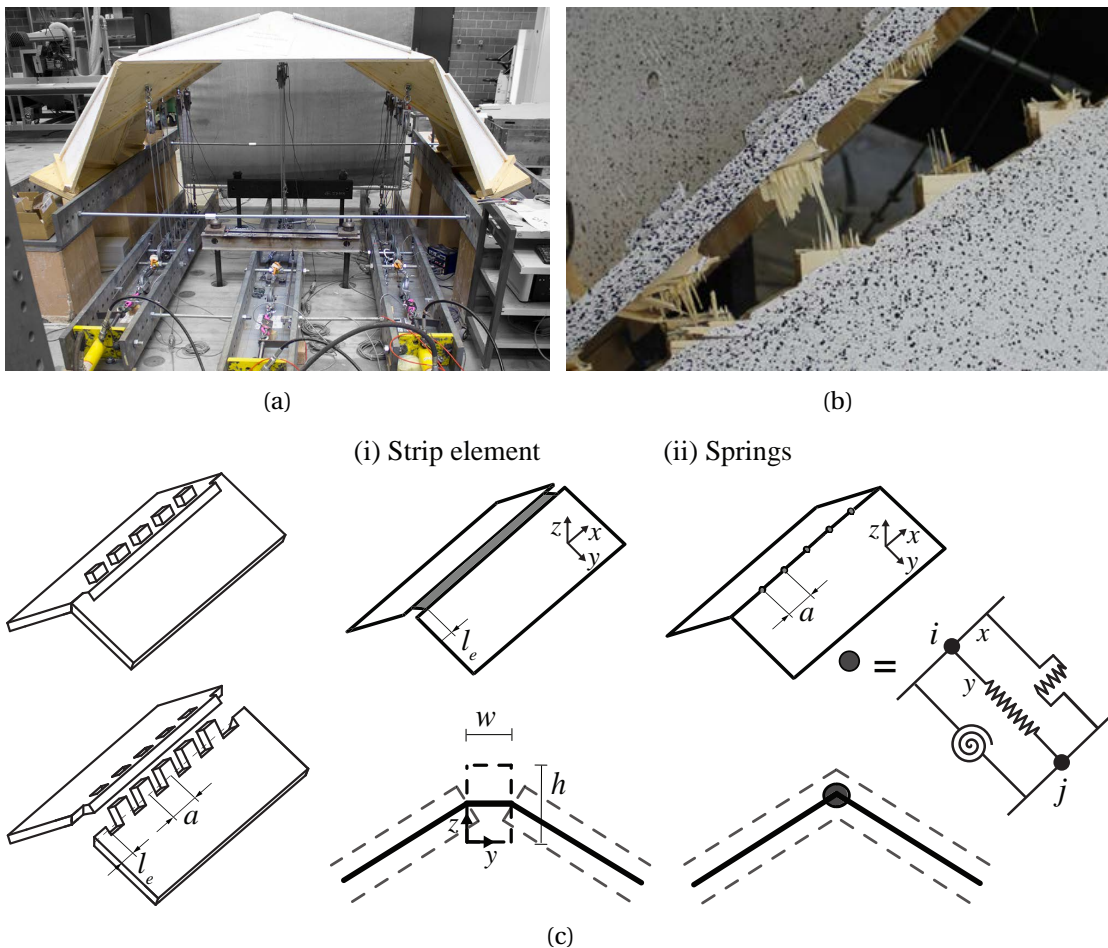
Timber folded plate structure with MTSJ-TT: (a) Pulley-based loading test setup. Reproduced from [106] (b) Failure of MTSJ-TT. Photograph by Andrea Stitic. (c) Connection detail representation using (i) strip elements (ii) springs. Adapted from [105].
